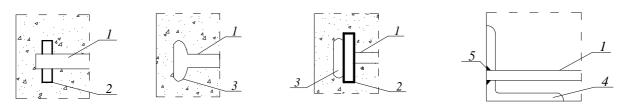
The examples of the anchorage of a longitudinal bar by the means of special devices: 1 - bar; 2 - anchor washer; 3 - buttenhead; 4 - angle seat; 5 - welding
